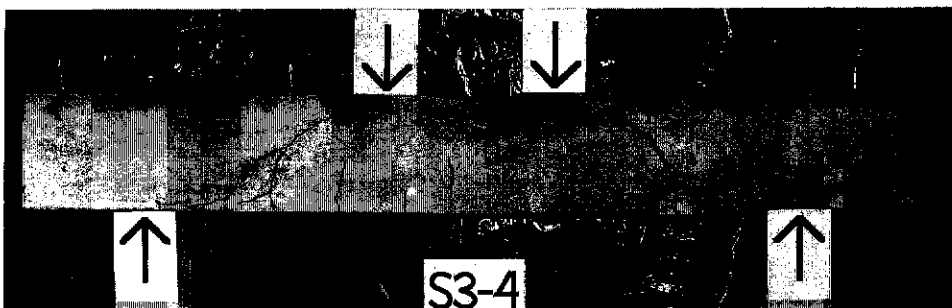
Crack Pattern of the Back Face of Beam S3-4
